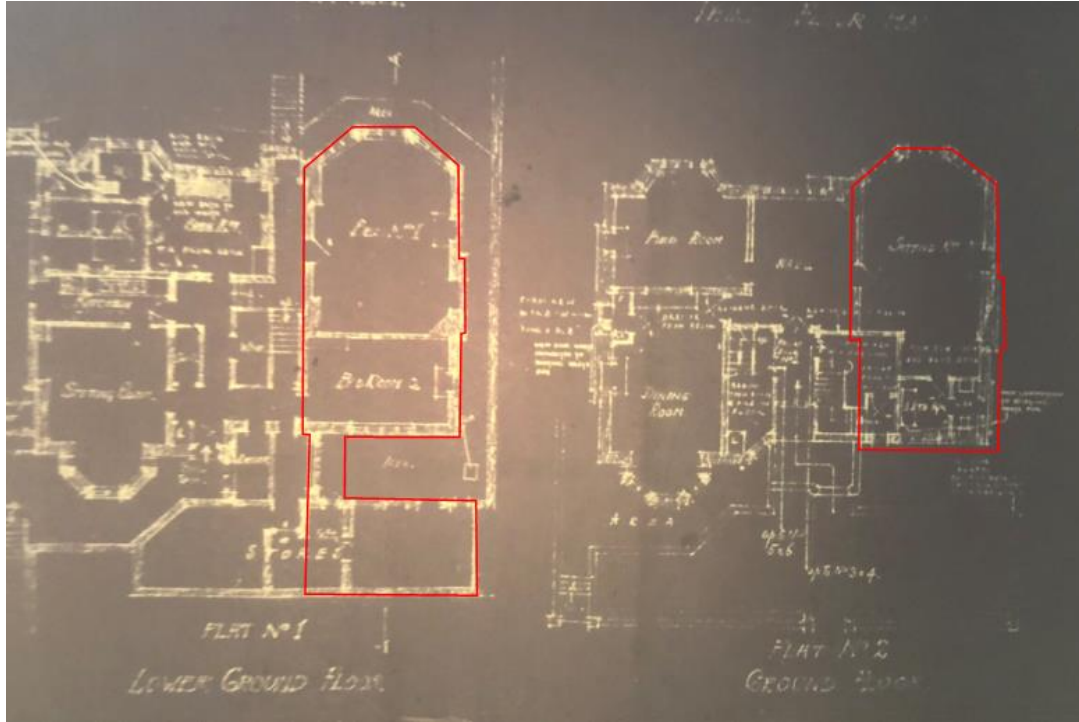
1945 Drainage Plans showing historic layout of the ground and lower ground floors. Outline of the existing flat shown in red.
